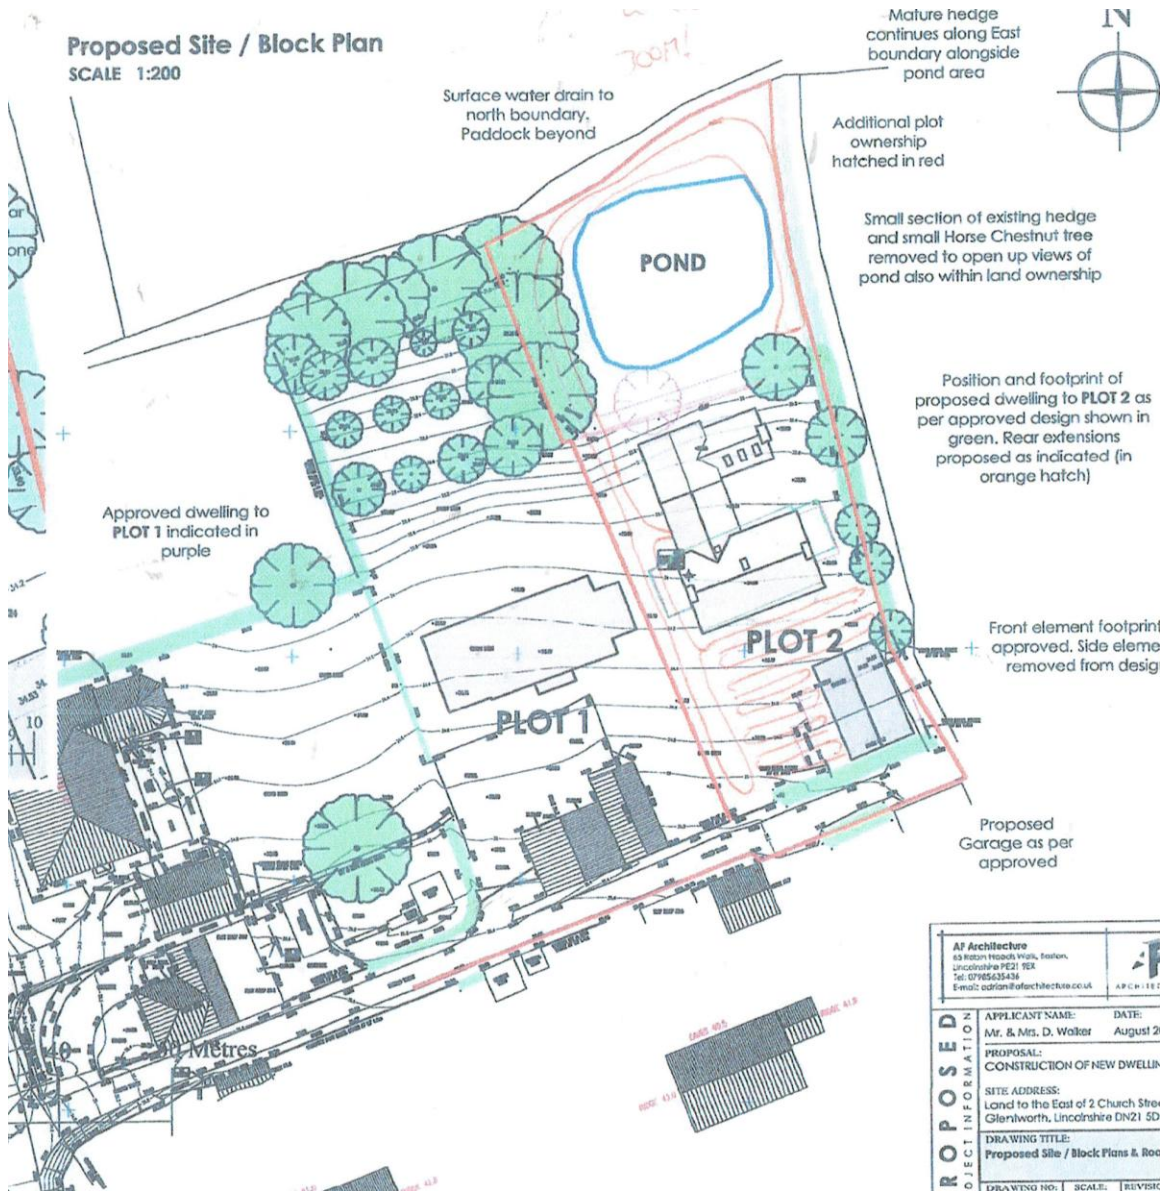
Block plan showing the proposed layout of Plot 2 at an original scale of 1:200, (not to scale), (extract from Architects plan)
